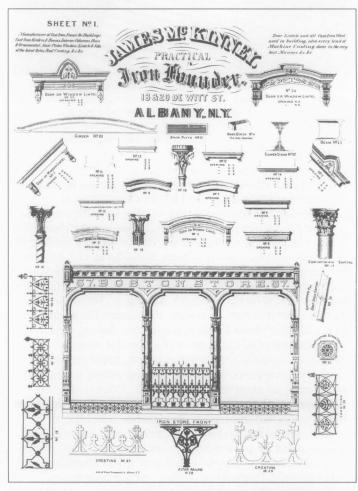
Sheet from a late 19th century manufacturer's trade catalog illustrates some of the products available from foundries, such as storefronts, girders and beams, columns, stairs, window lintels and sills, and roof crestings. Courtesy: Albany Institute of History and Art.
